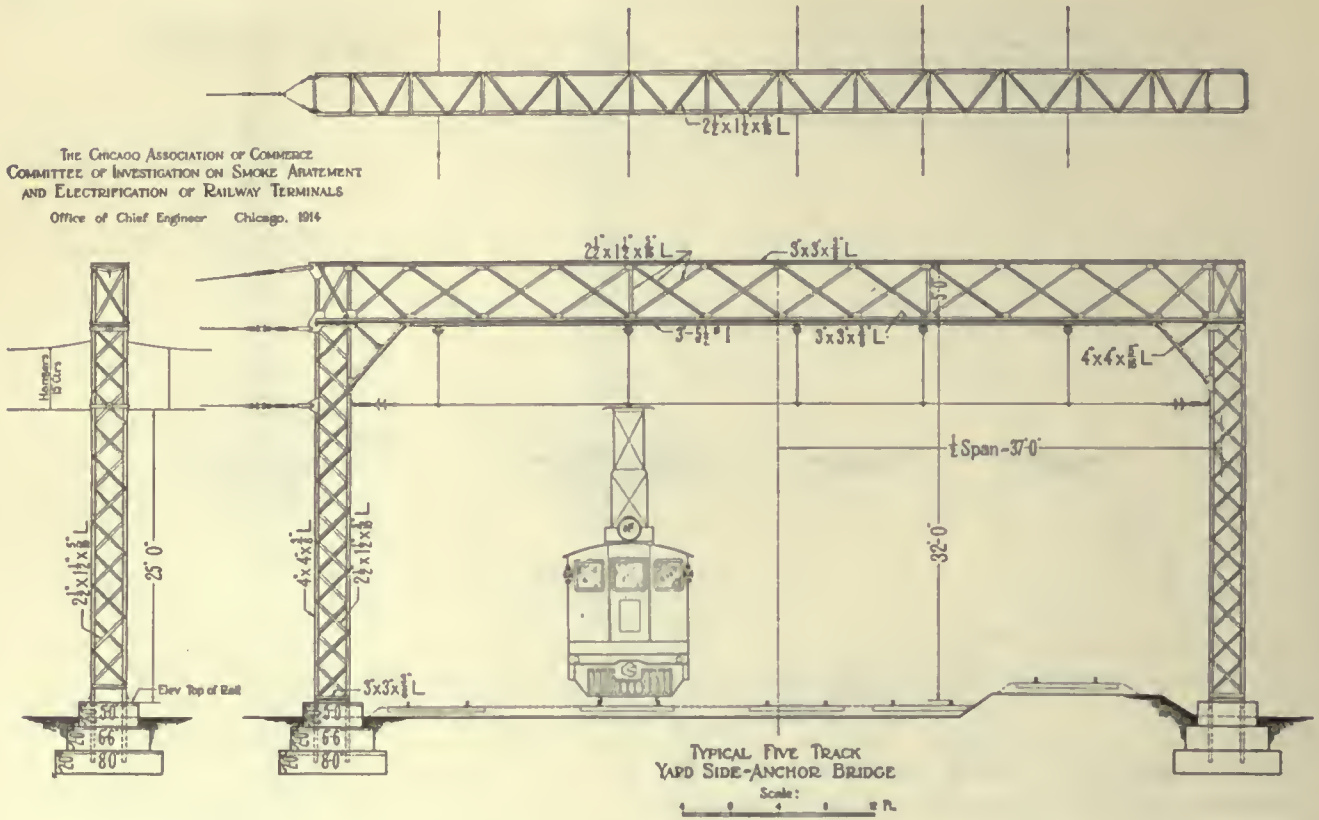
TYPICAL FIVE TRACK SIDE ANCHOR BRIDGE FOR CROSS CATENARY YARD TRACK CONSTRUCTION
